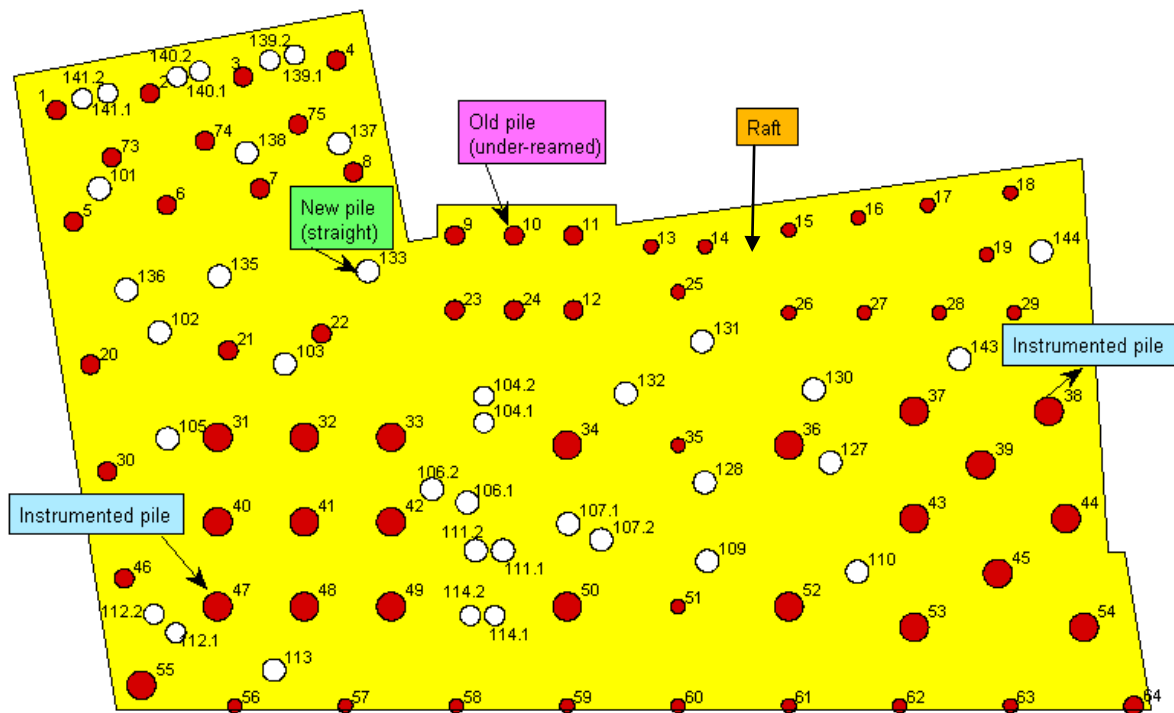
Foundation layout for old and new building at Bevis Marks
